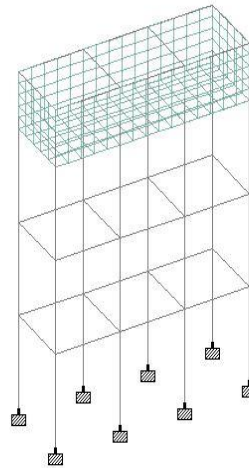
OVERHEAD RECTANGULAR TANK DESIGN
